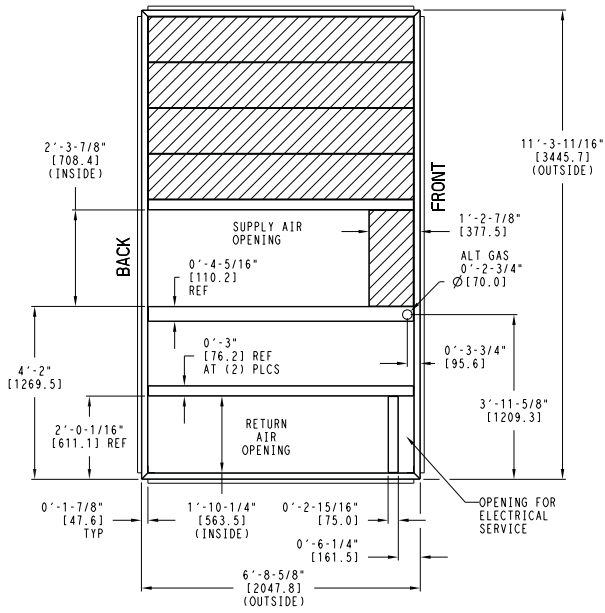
Dimensions 50LC*B17 - 20, Sheet 3 of 3
